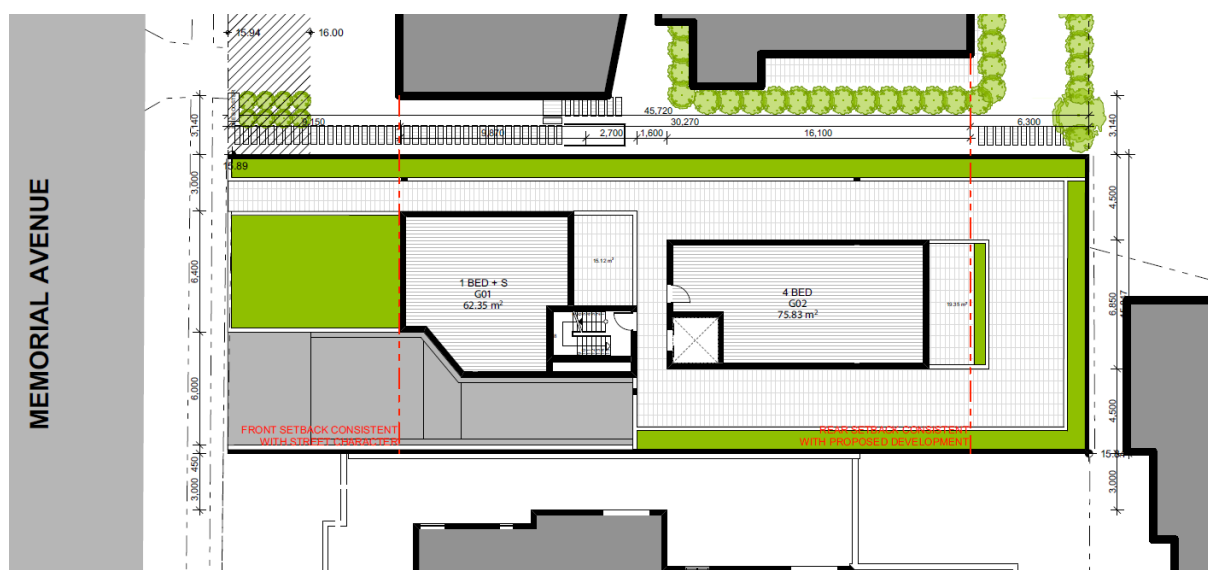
Potential ground floor level building envelope for the neighbouring site to the east
